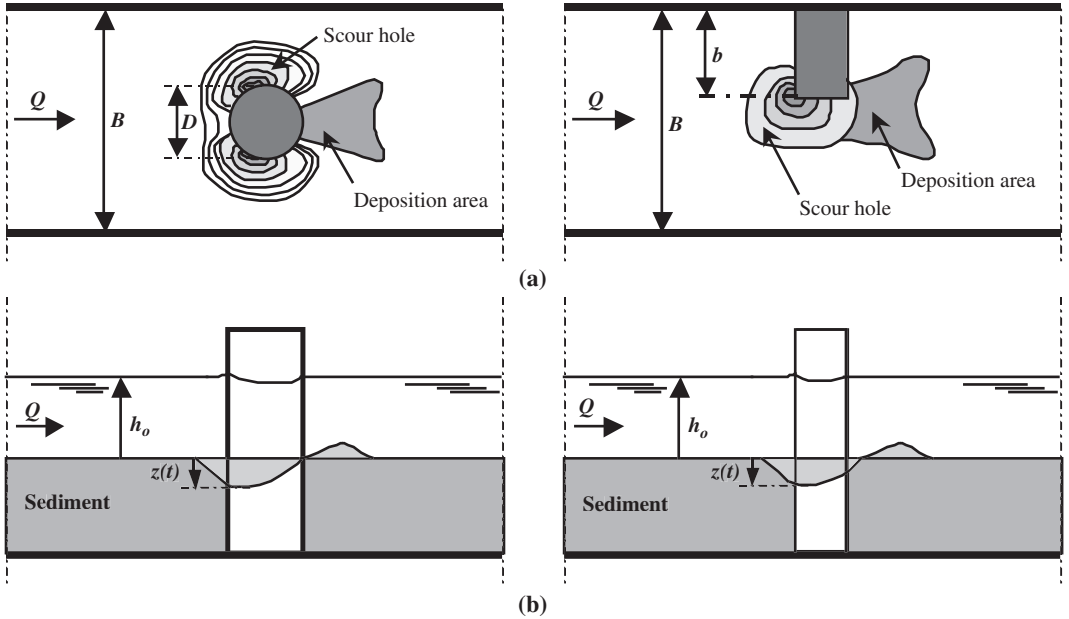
Definition plot for bridge pier (left) and bridge abutment (right), (a) plan, (b) section.
